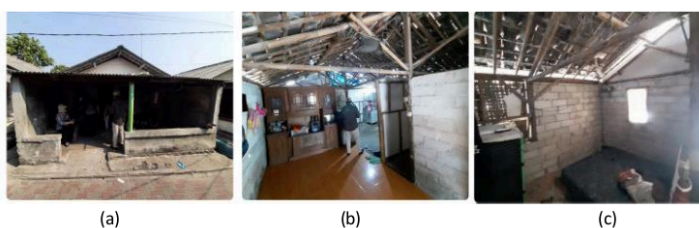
(a) front of the house (b) family room (c) bedroom to the front view (source: author)
